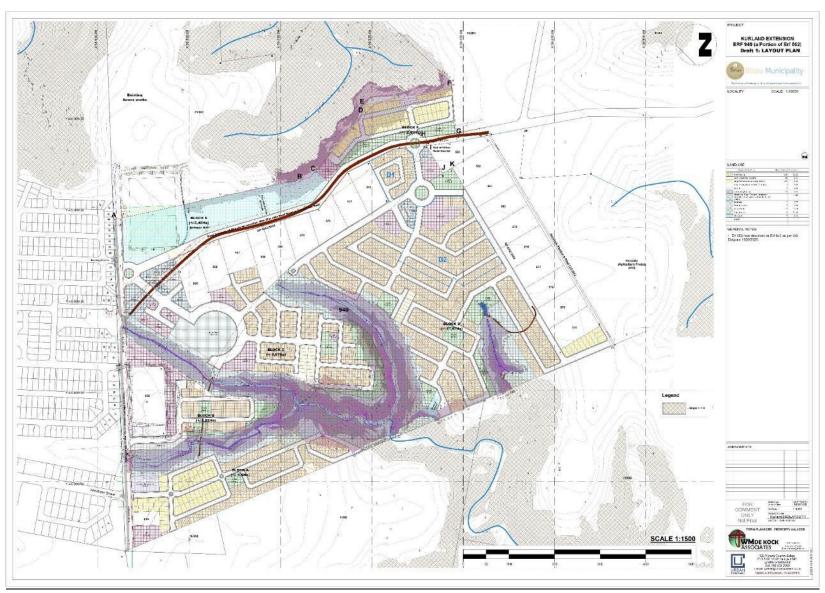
Proposed Preferred Layout 1 (see Appendix C for full-scale drawing).
